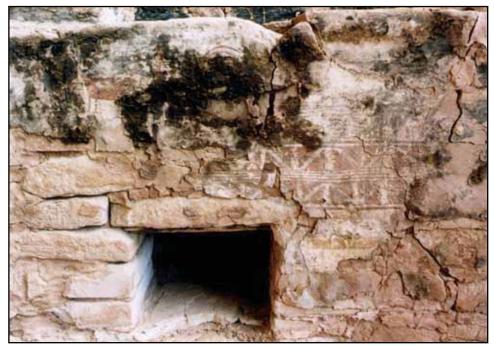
North wall after recontruction (Hannah 05/05/1961).
